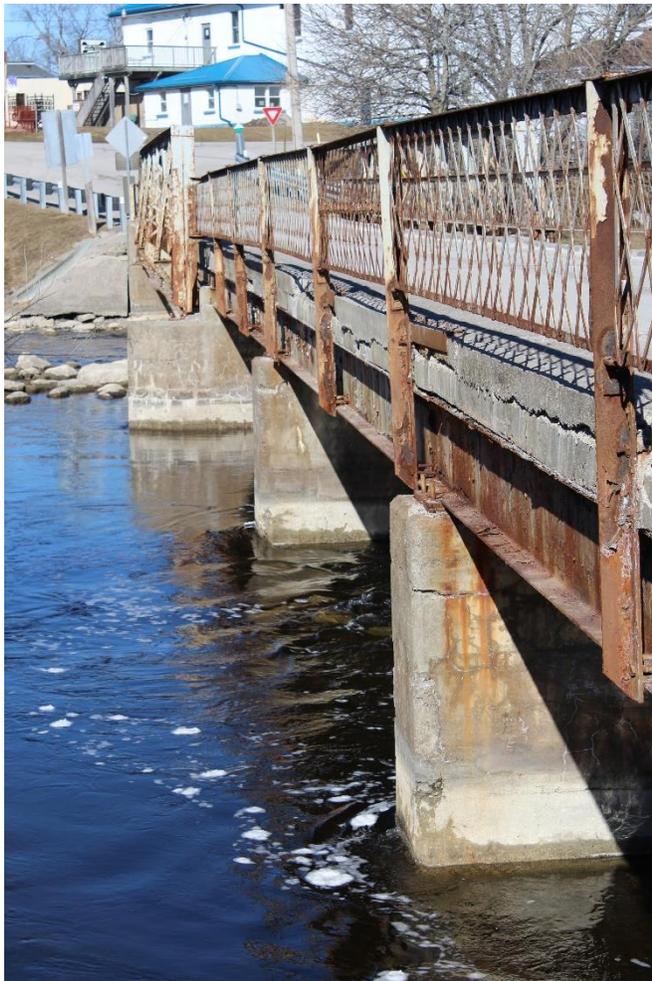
Oblique view of the south elevation of the I-beam spans and view of concrete piers on south (upstream) side.
